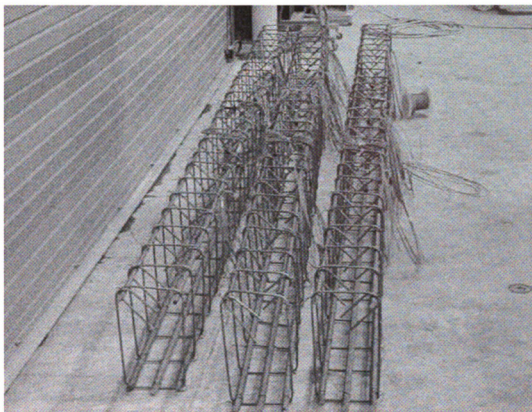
Layout of Steel Reinforcement before Concrete Placement
